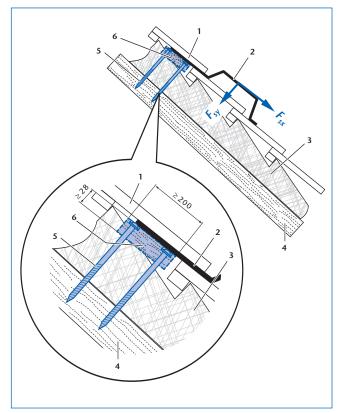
/1 shows the roof connection to a roof with insulation on rafters using the special hooks. The roofing contractor must secure a wooden board with a minimum cross-section of 28 mm x 200 mm to the rafter. The force that is introduced by the roof hook must be transferred by this board to the load-bearing rafters. With an assumed maximum snow load of 2 kN/m^2 (without accessories) or 3.1 kN/m^2 (with accessories), the following force per roof hook must be allowed for:
